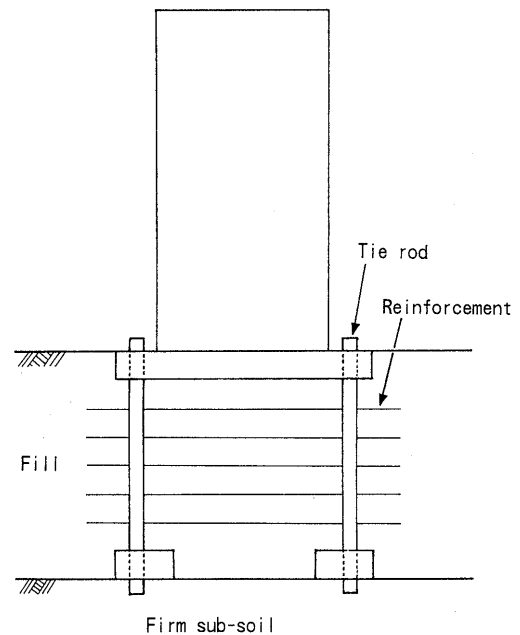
One of the possible applications for a fill supporting a heavy structure
